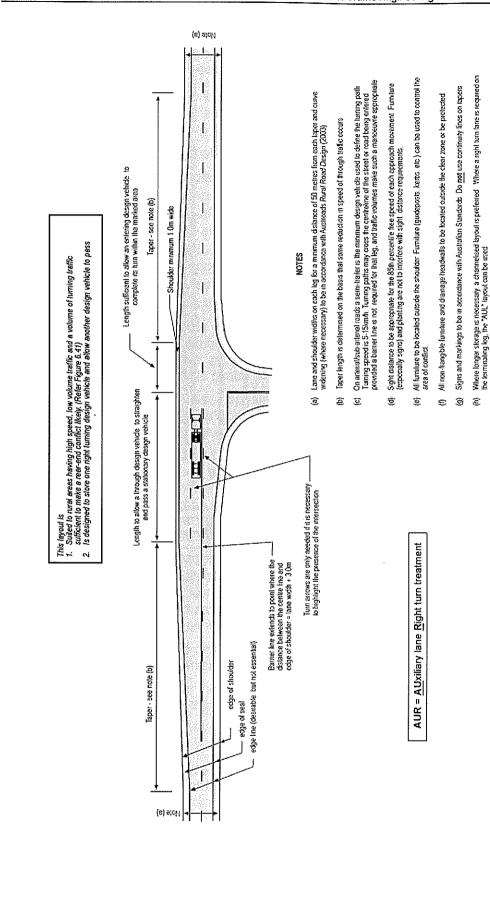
Rural Type AUR Layout (This layout is not applicable in New Zealand)
